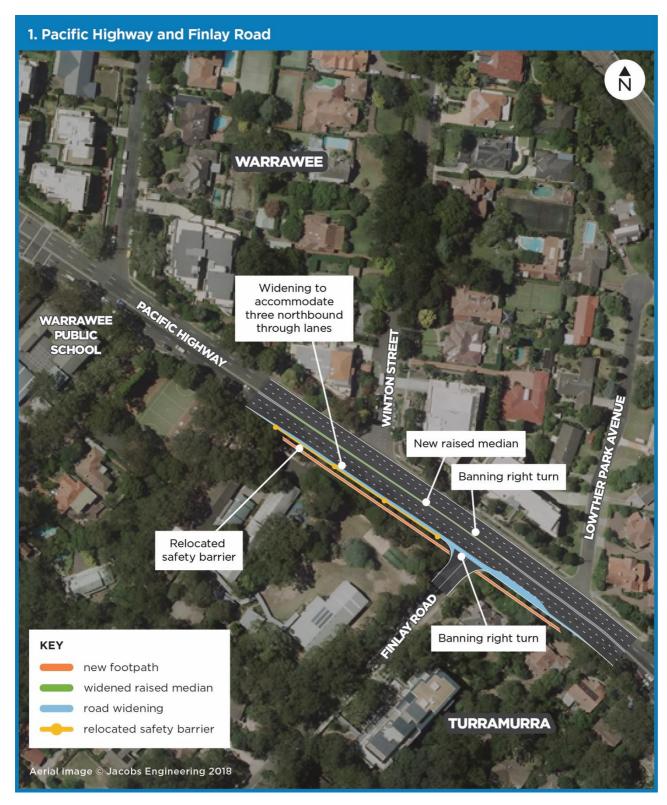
Proposed intersection upgrades at Pacific Highway and Finlay Road
